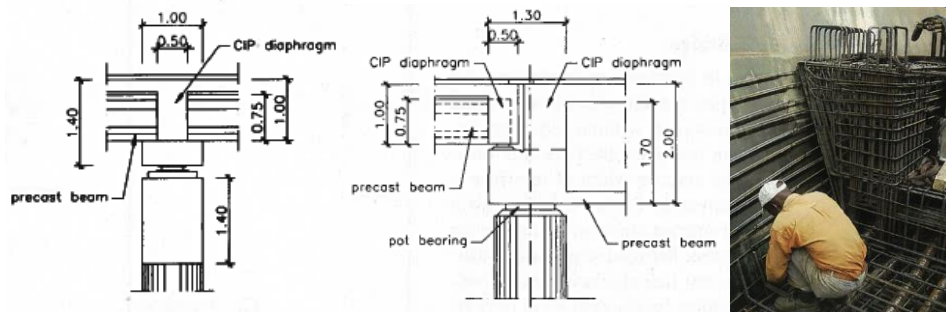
Cast-in-place diaphragms for tub-girders and reinforcing details (Cruz and Wisniewski 2004)
